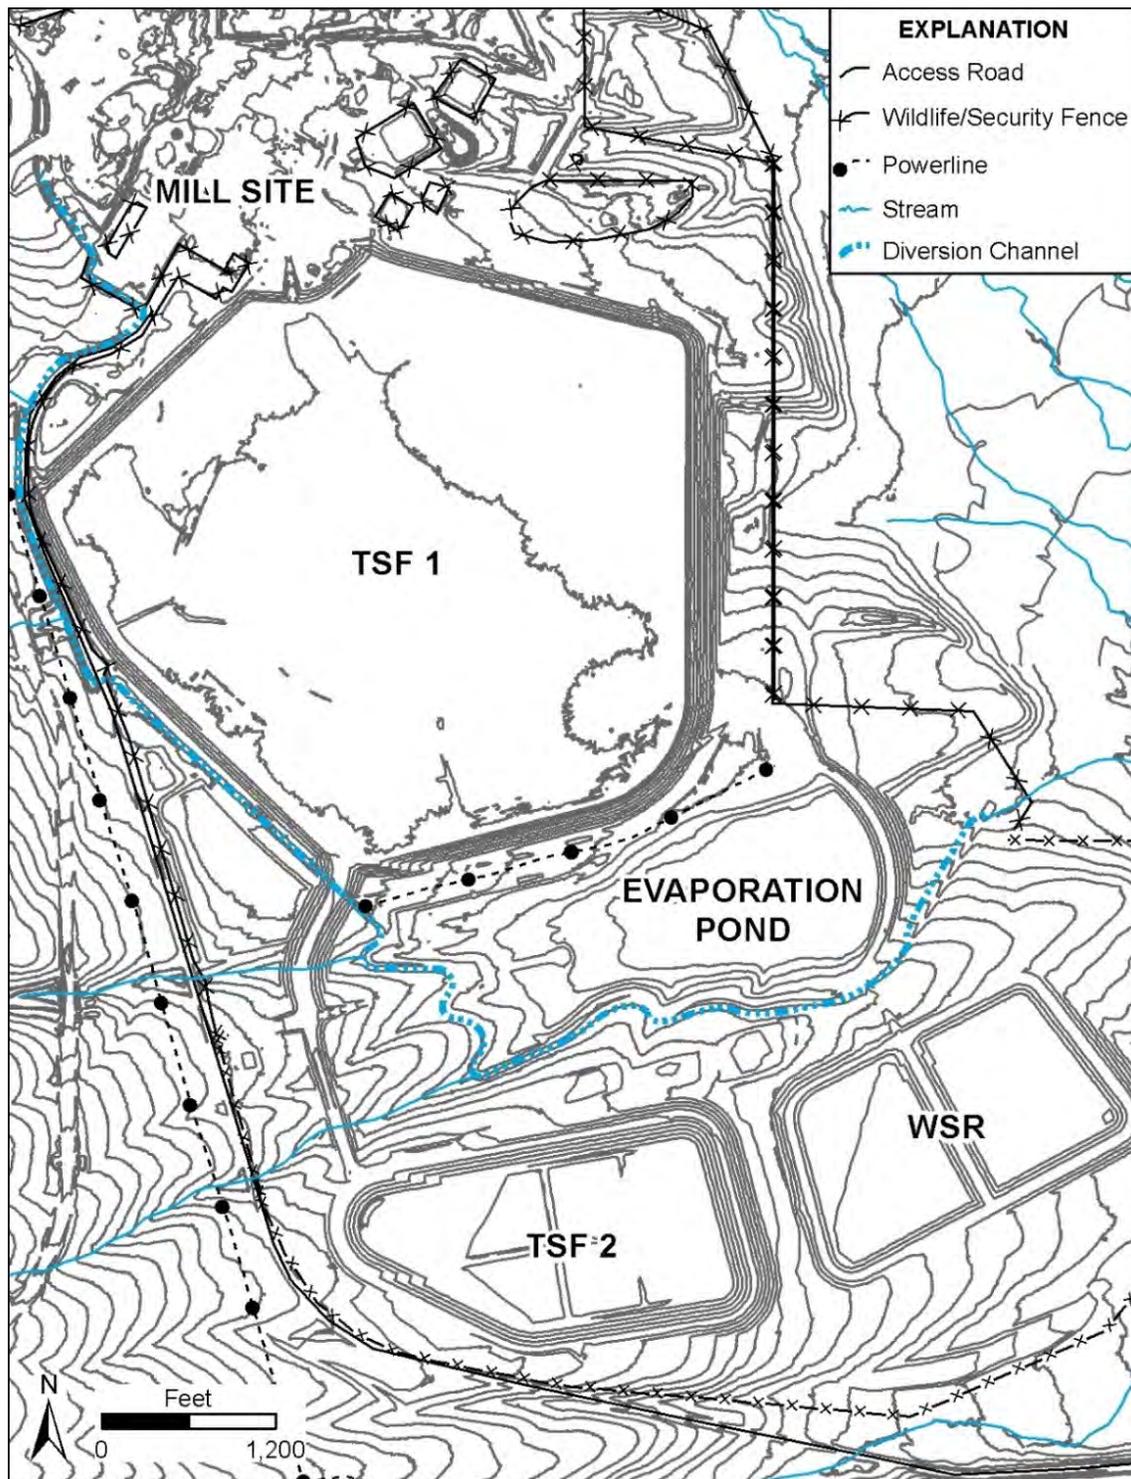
Jerritt Canyon Mill Site and the TSF 1 layout
